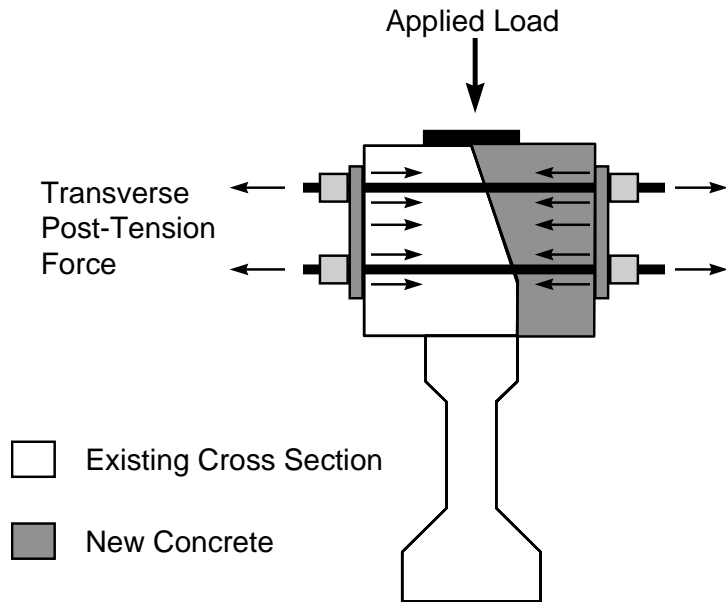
Schematic of Steck Girder Cross Section Showing Additional Concrete Placed to Facilitate Loading
